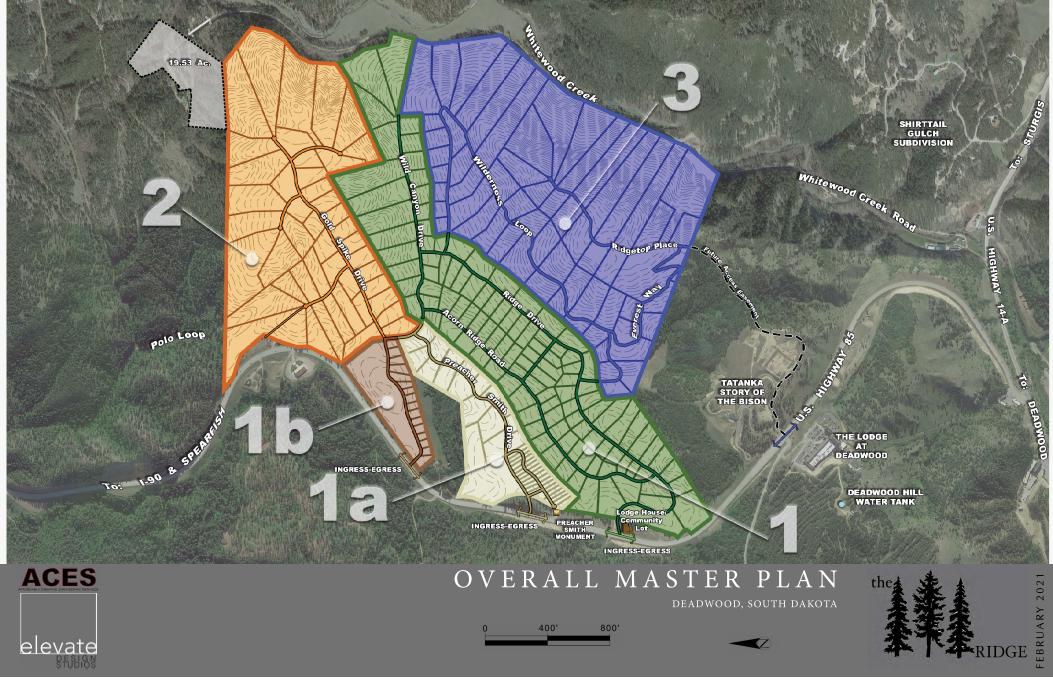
#### EXHIBIT A PROPERTY LOCATED IN TIF BOUNDARY MASTER PLAN OVERVIEW PLAT
